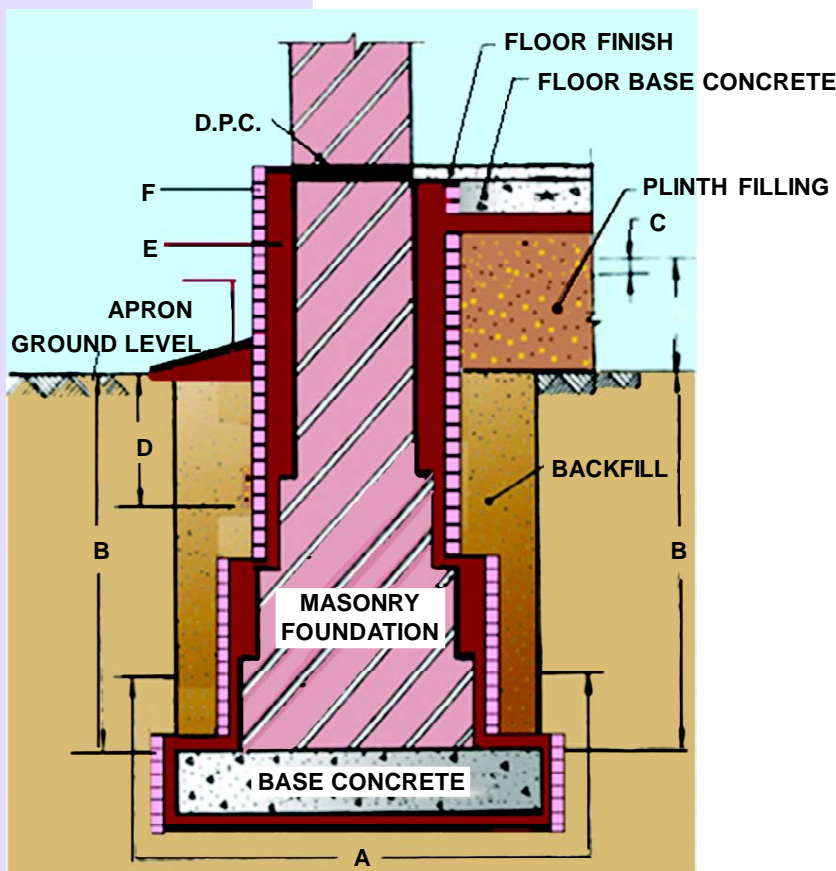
Anti-termite barrier (E) with 100 mm barrier support wall (F)
